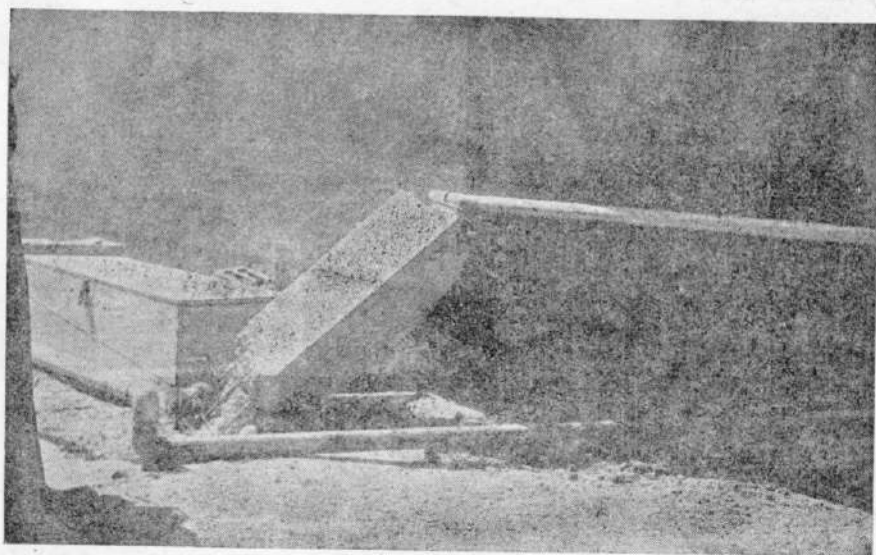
Damage to reinforced water tank columns, inadequate reinforcement and ties.
